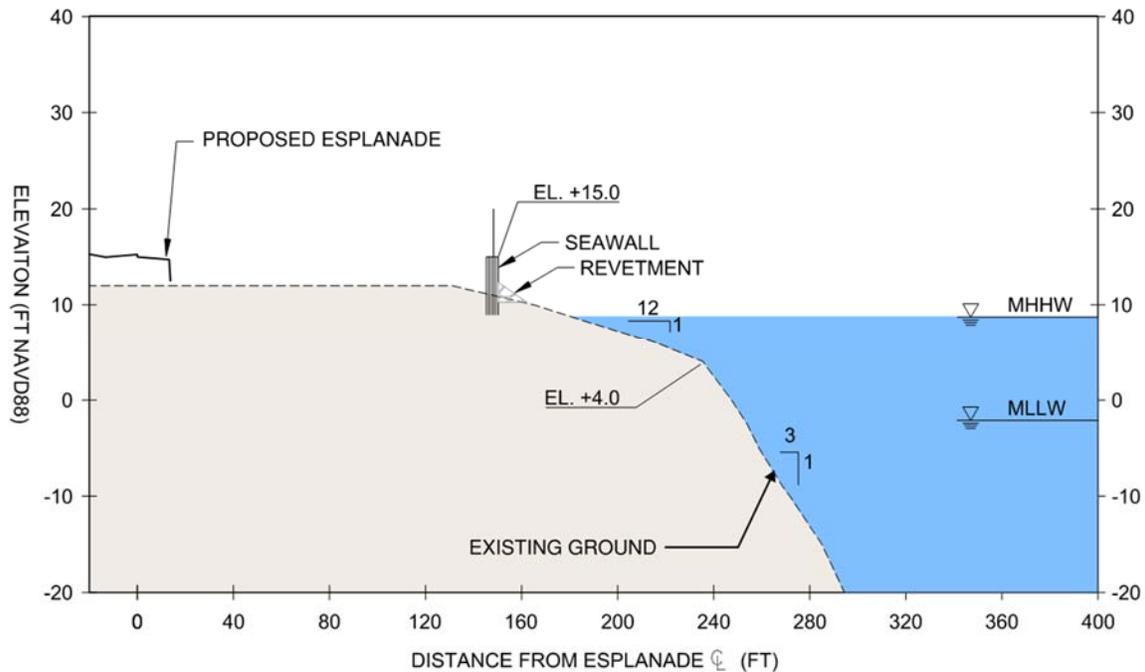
Elevation profile for a typical section of Reach 2. Elevations are referenced to NAVD88 in feet. Location and details of seawall and revetment are approximate.
